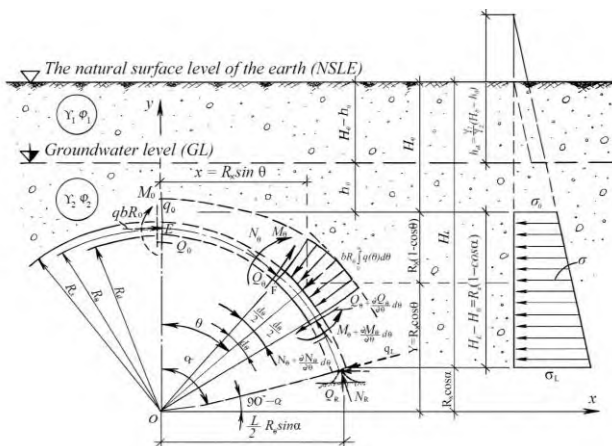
Calculation scheme for the effect of static loads on the arch section of pressureless hydraulic tunnels.
